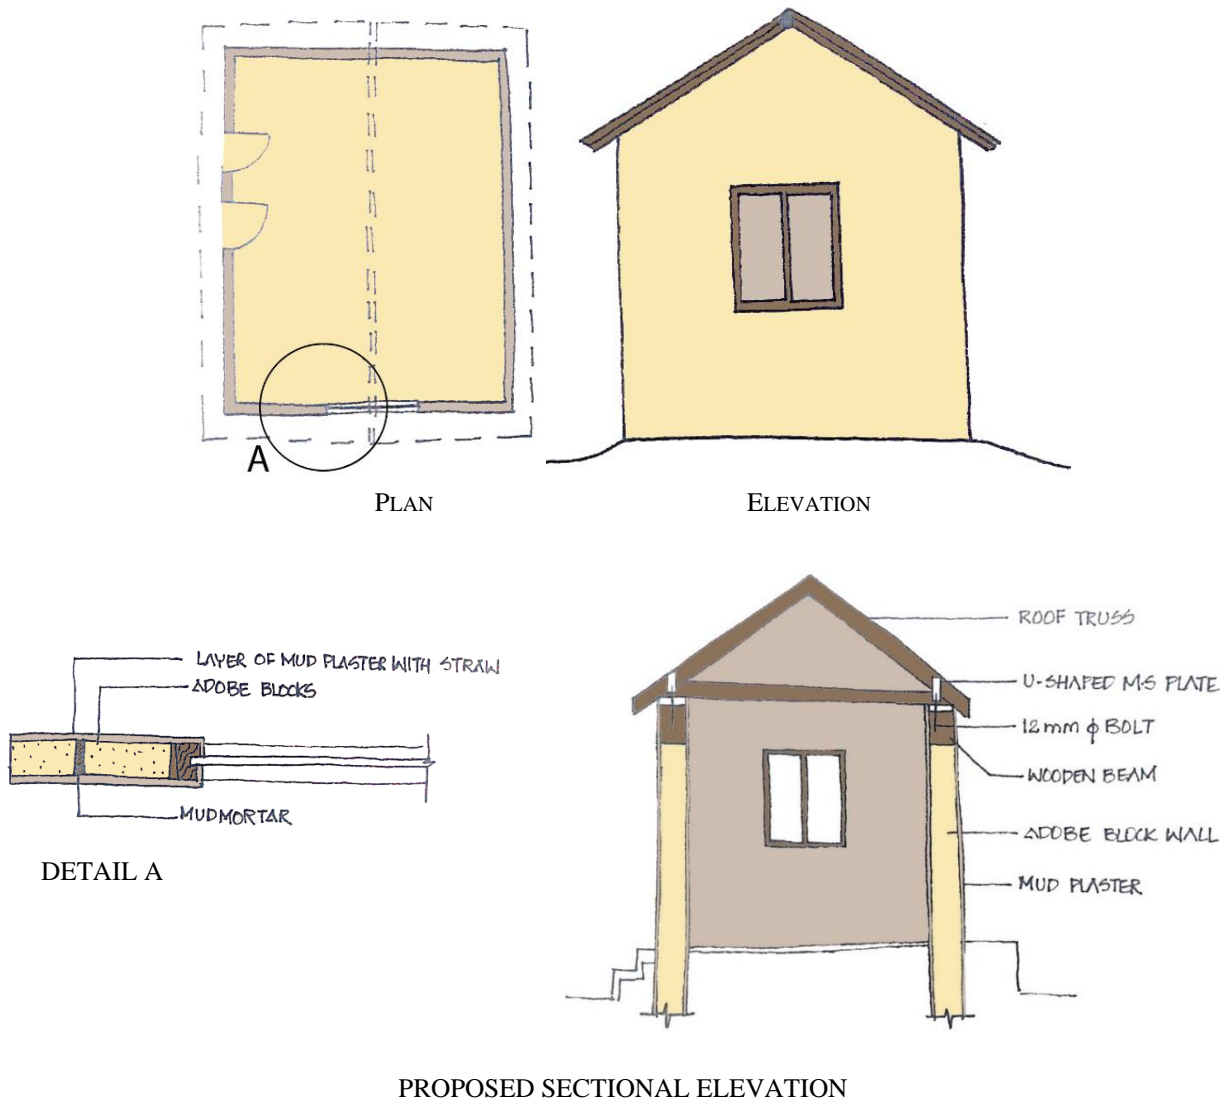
MUD WALL AND THATCHED ROOF HOUSE
